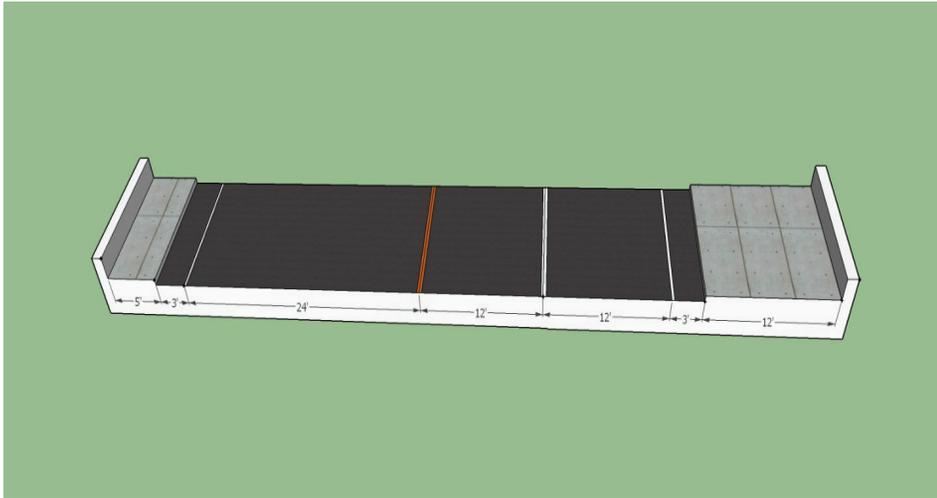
Current design of Arkwright Place in Edgewood, looking west from Vannoy Street
